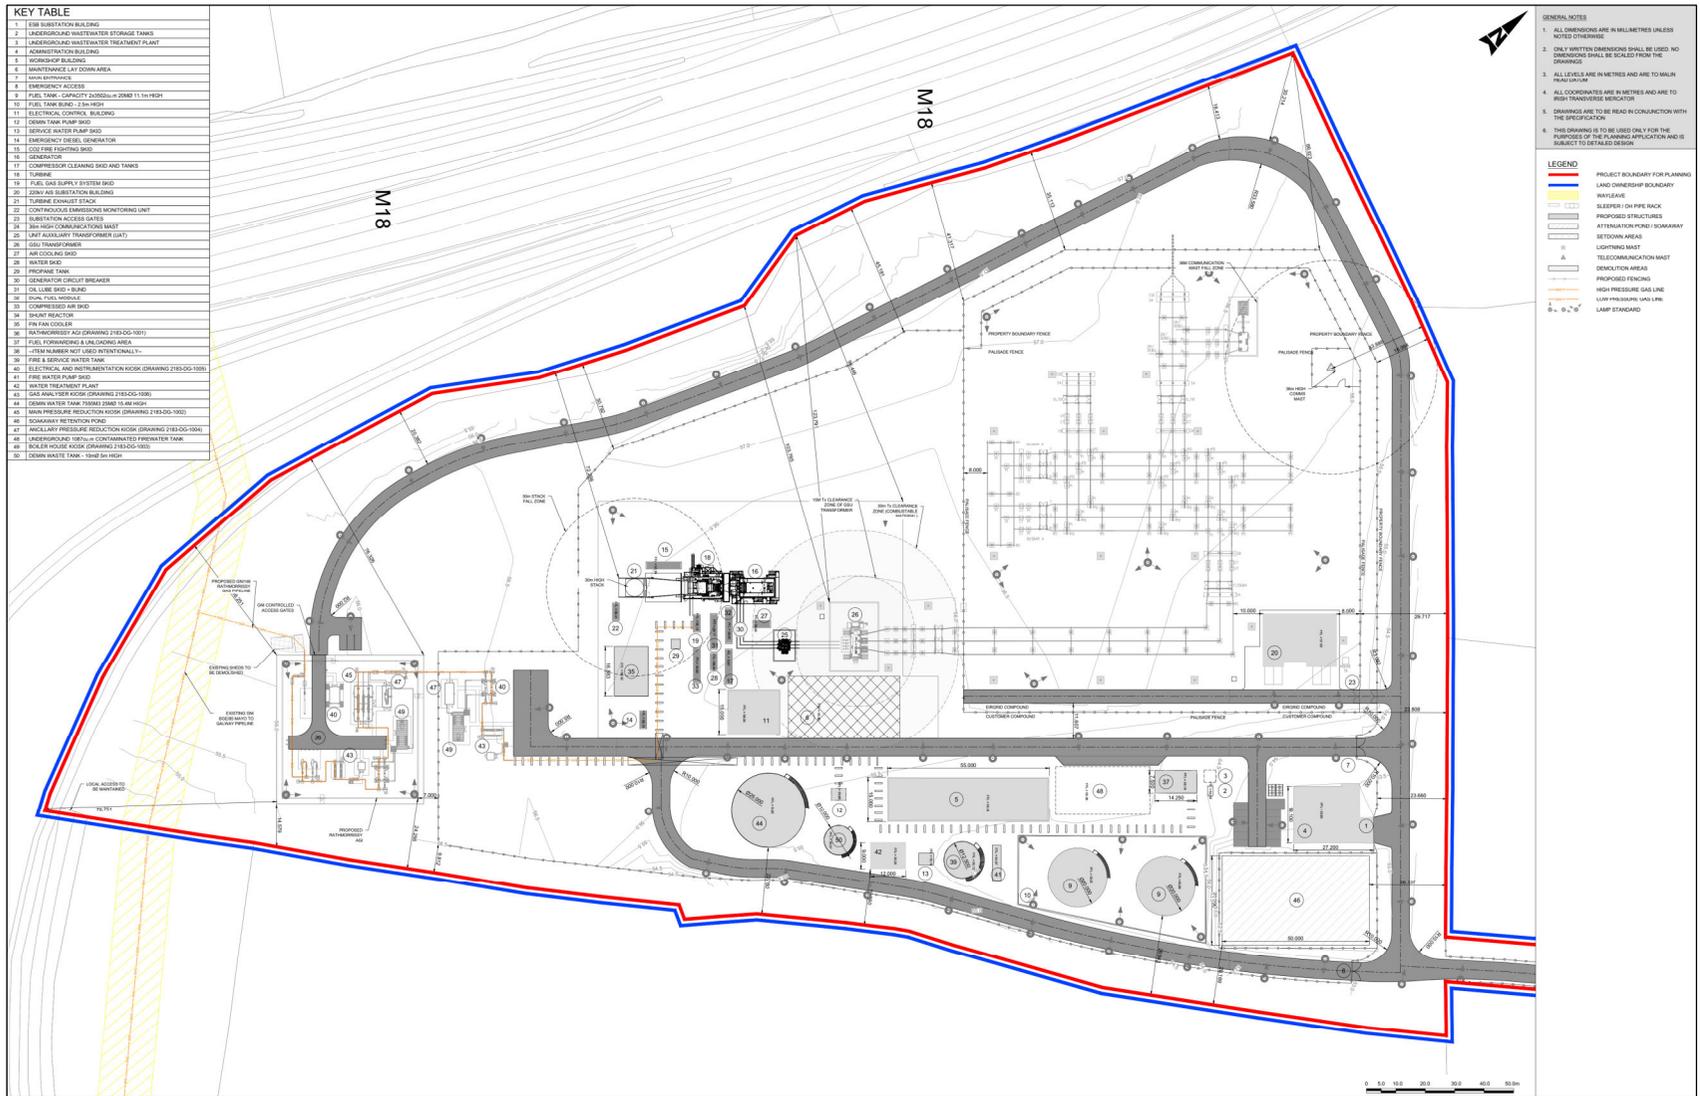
Proposed Peaker Plant Site Layout (showing relevant section of Proposed Project Boundary)
